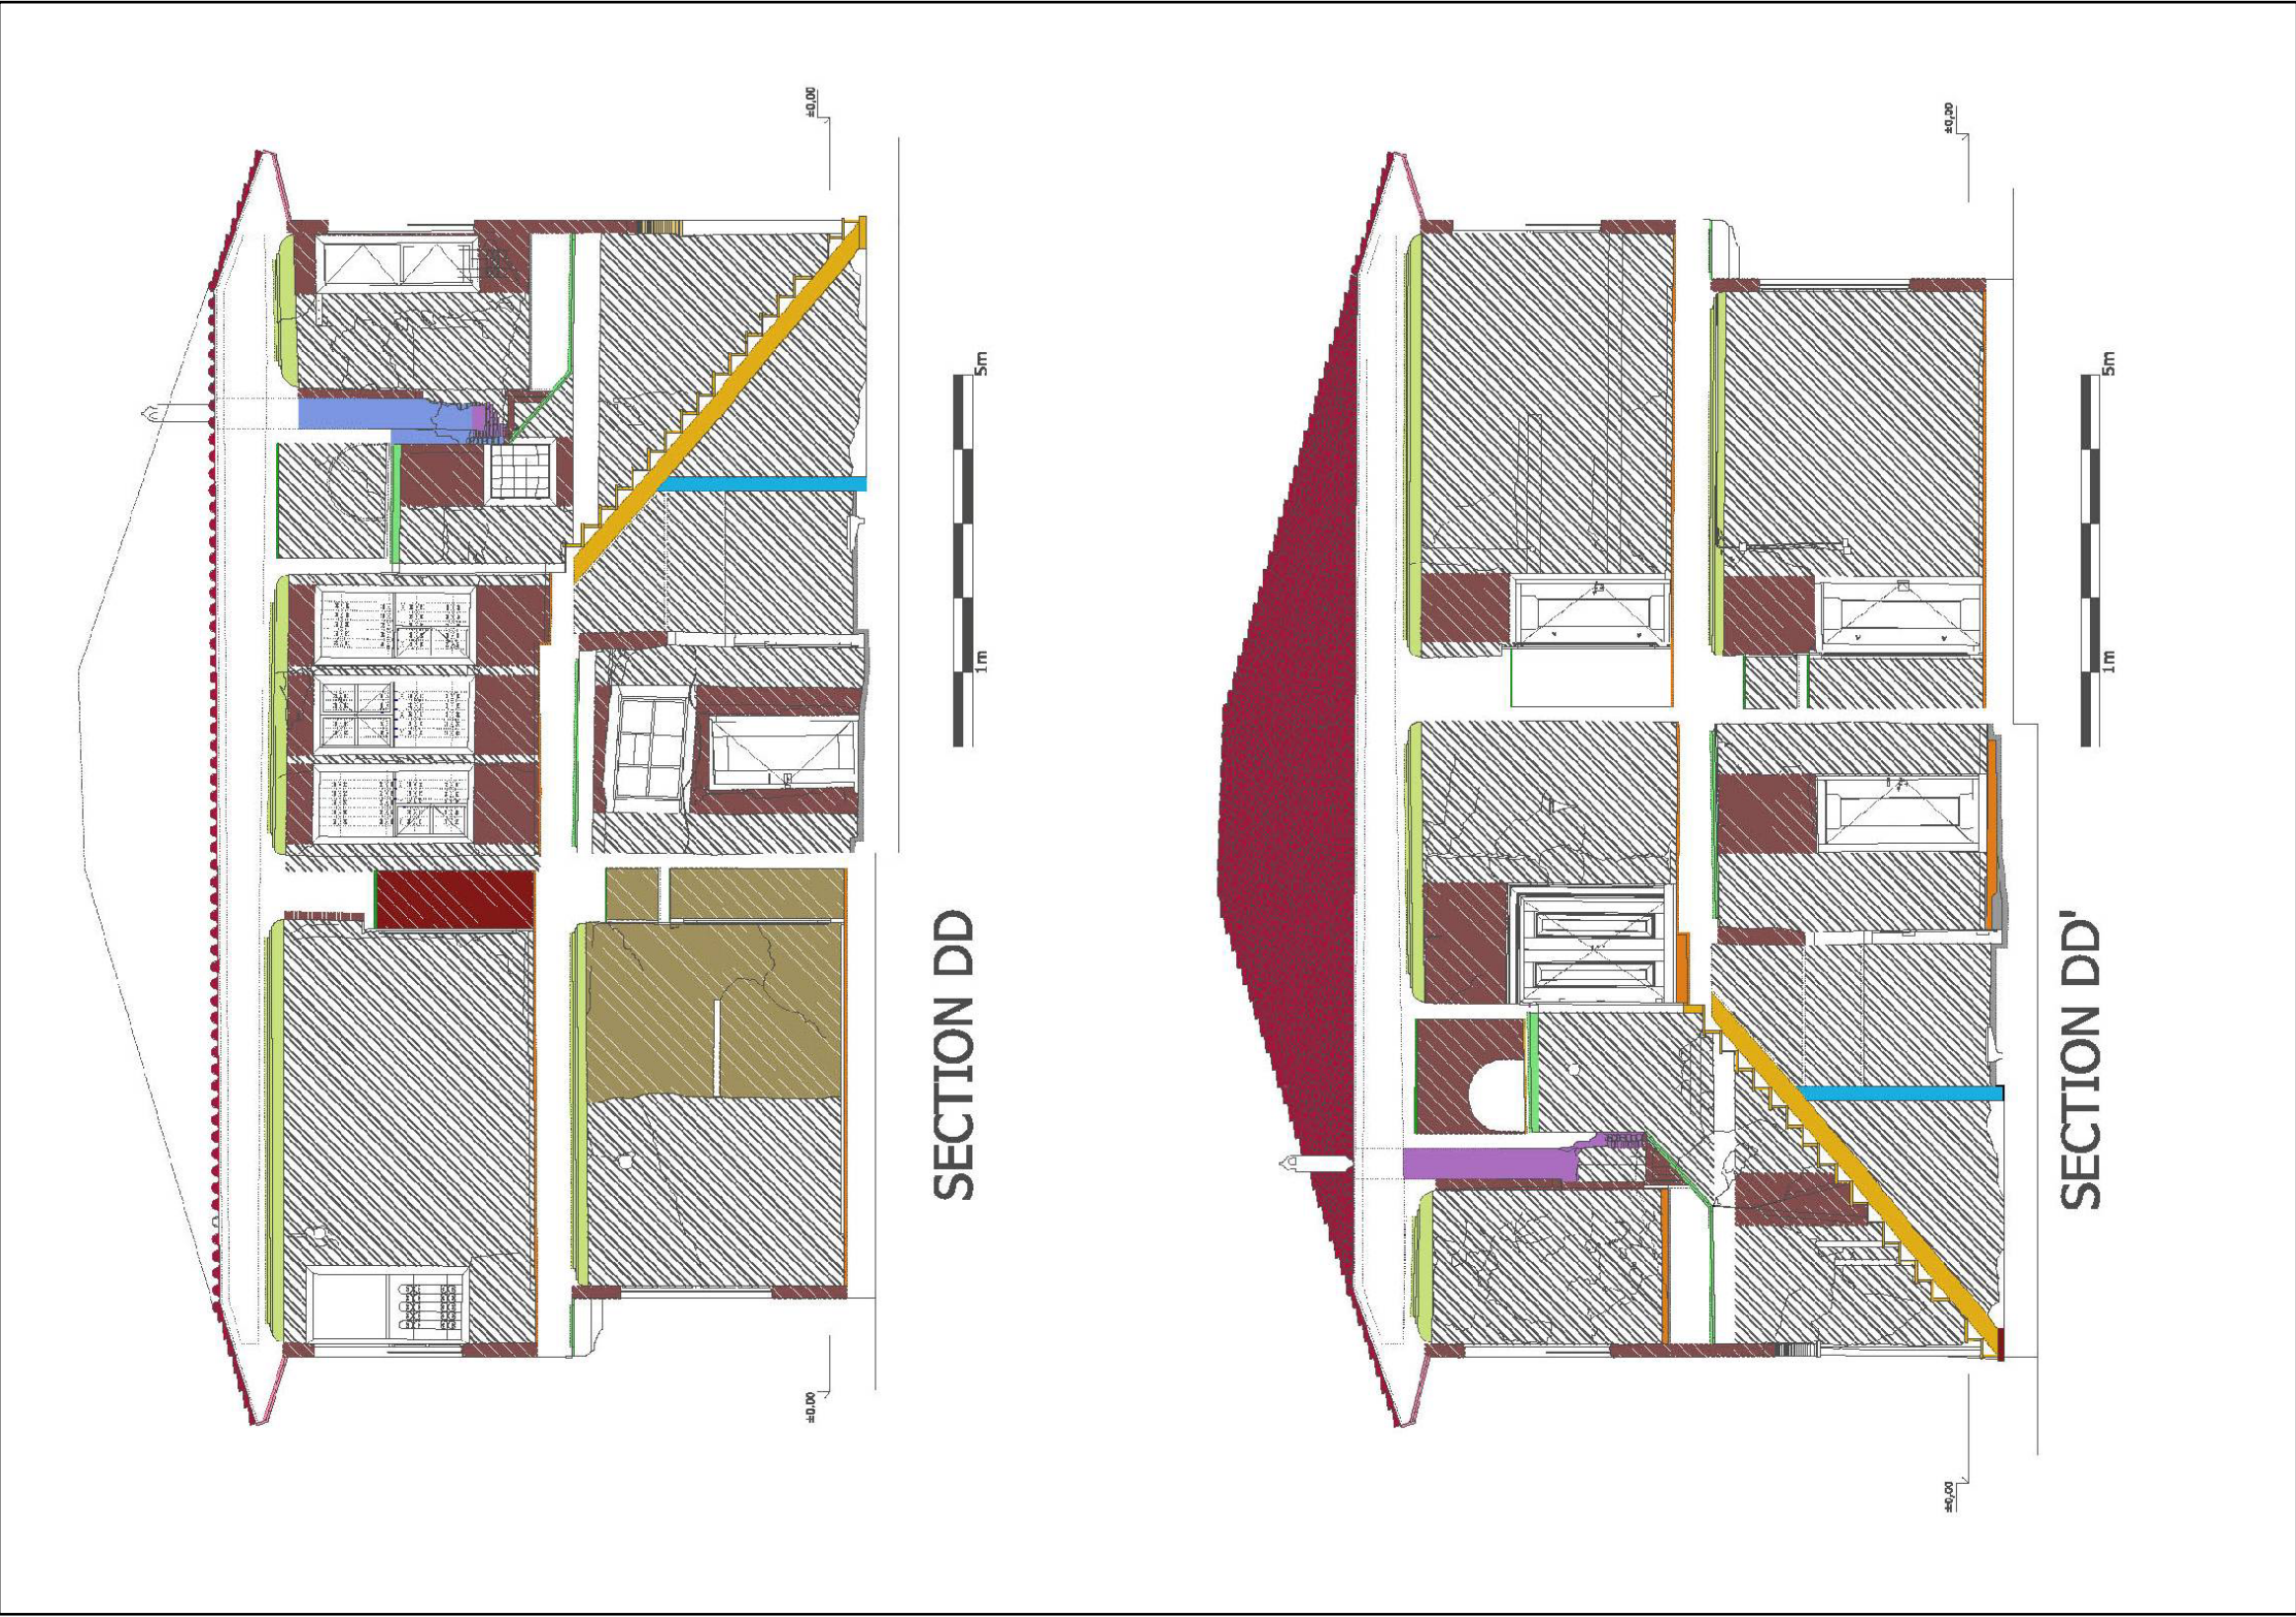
Analysis of Str. Syst. & Const. Tech.; Sections DD, DD'; 1/100 (Presented in 1/50 at Jury)
